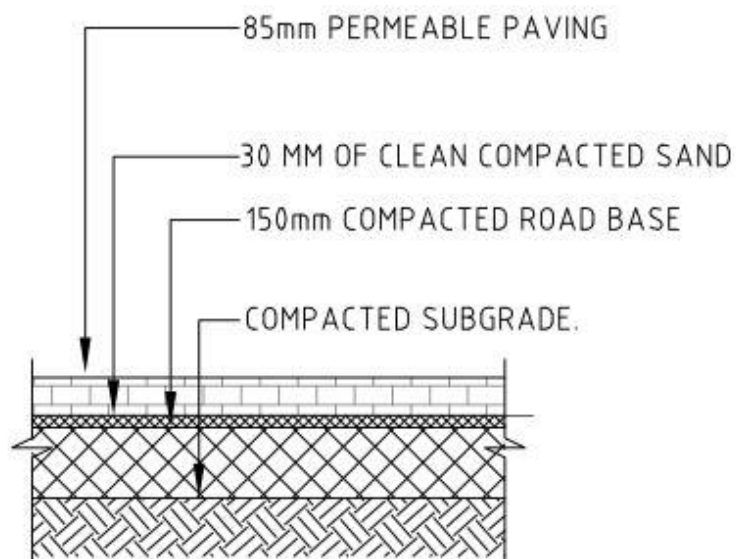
DETAILS OF INDIVIDUAL RIGHTS OF WAY
